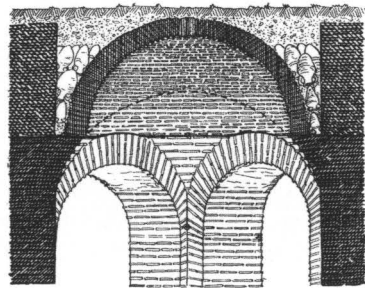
Section through the substructures of St George of Mangana showing a dome constructed without centering (Mamboury)
